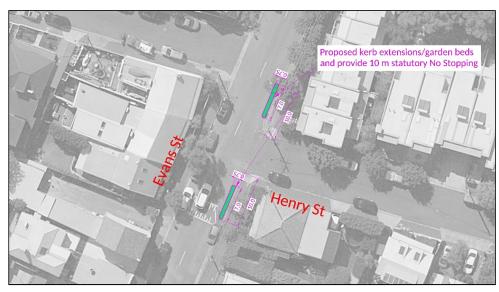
Evans Street / Henry Street T-intersection proposal.
